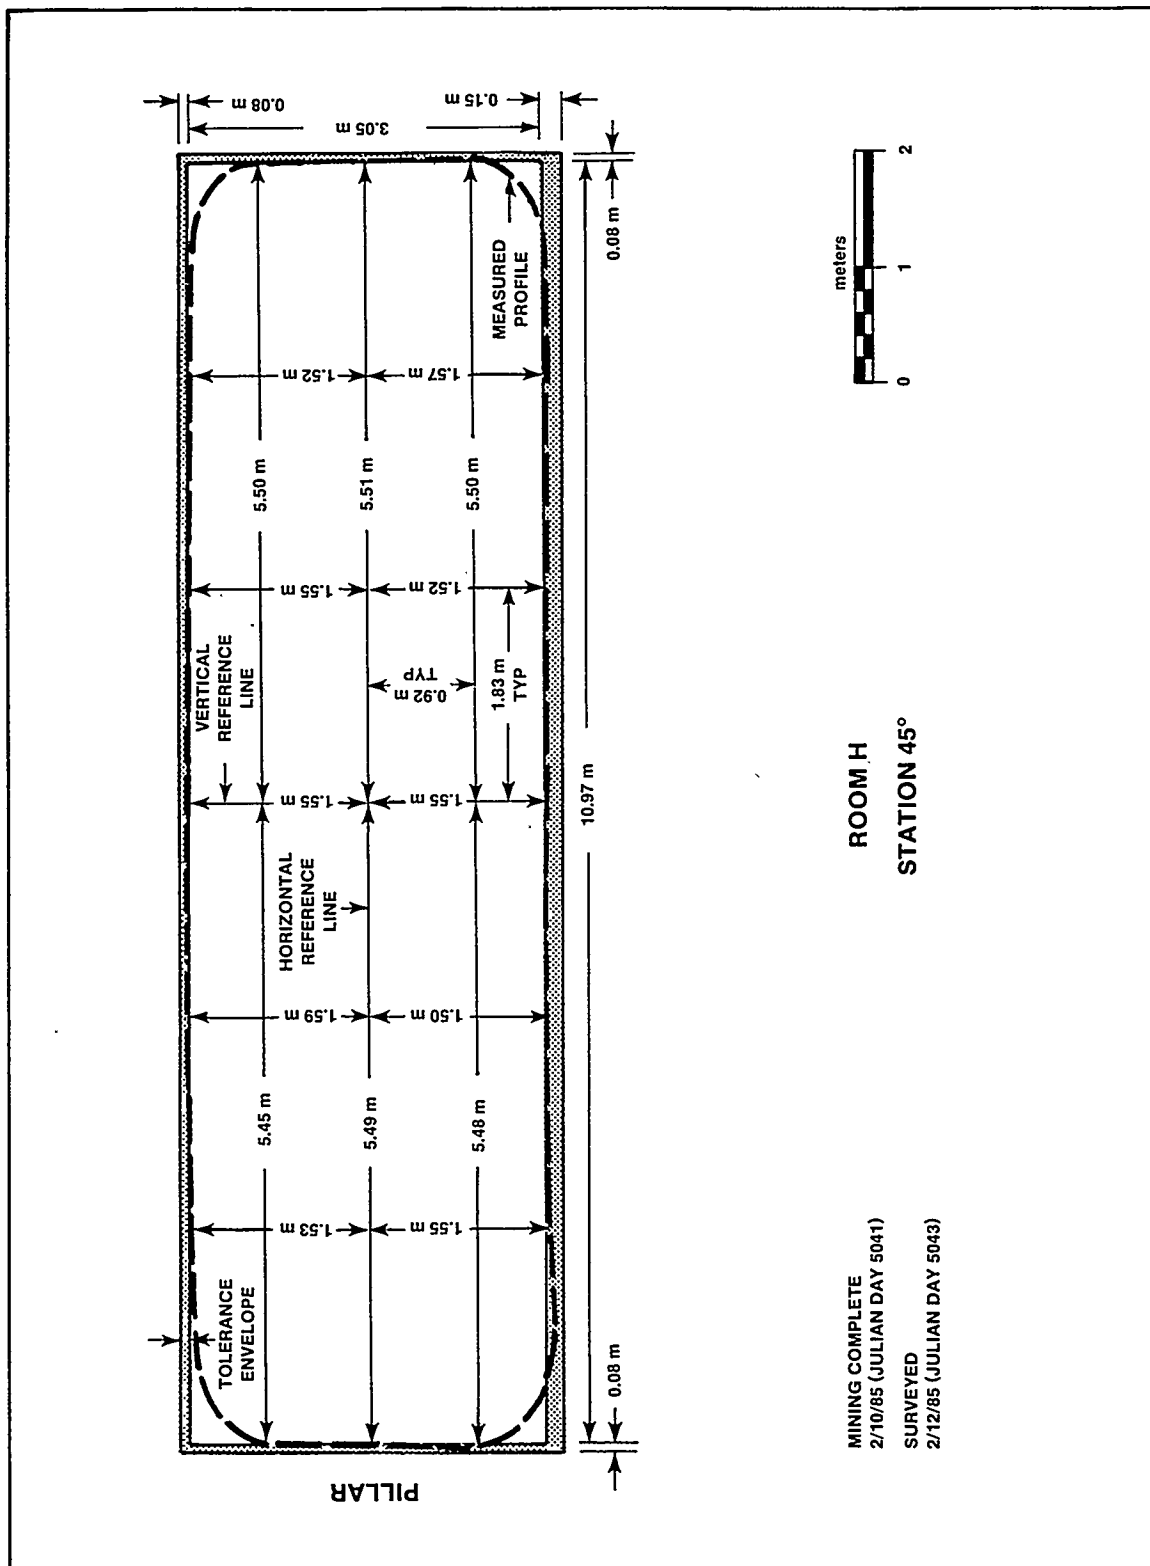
As-Built Cross Section of Station 45°, Room H
